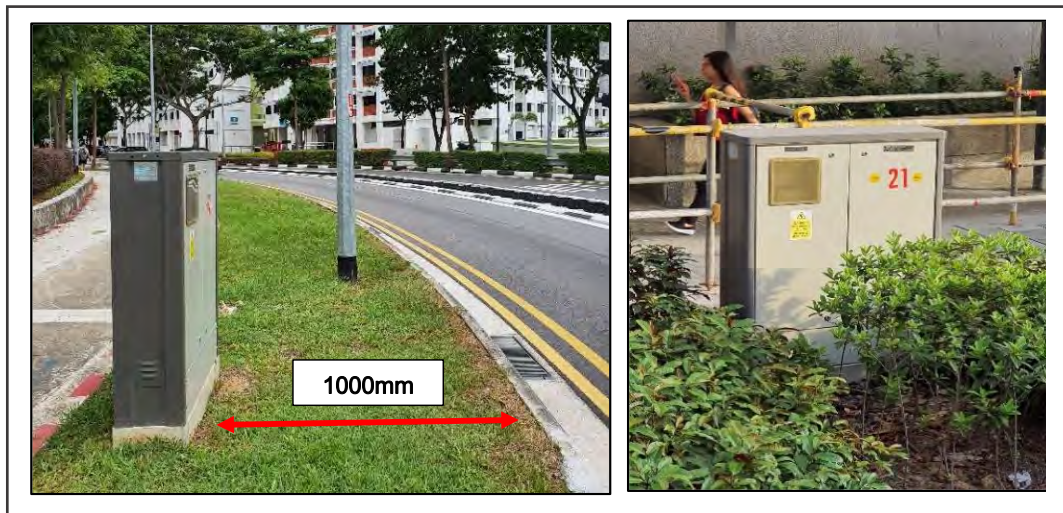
Clearance shall be at least 1000mm from Road Kerb, Panel Access shall not be Blocked by Planter or Shrub
